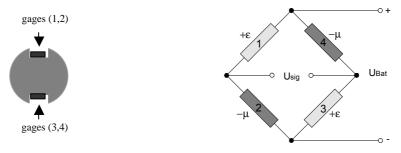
Position of gages in the cross section of the reinforcement bar (left) and whole bridge formed by two combined gages (right)
